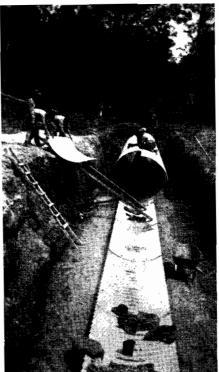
Installation of 75-in. multiplate culvert at McDonald's Creek.
